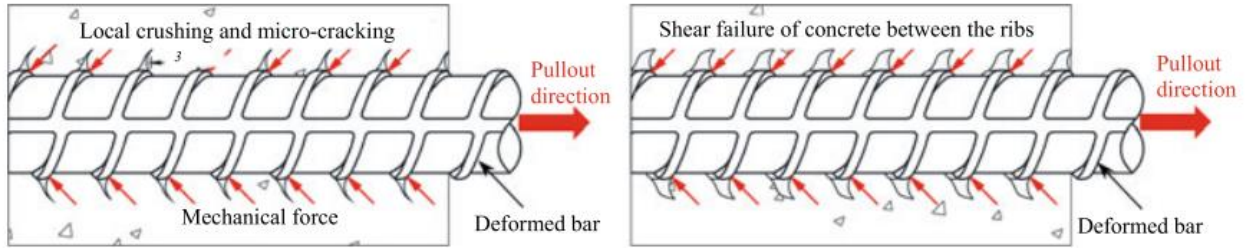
Embedded deformed bar in concrete, (Wang, 2023)
